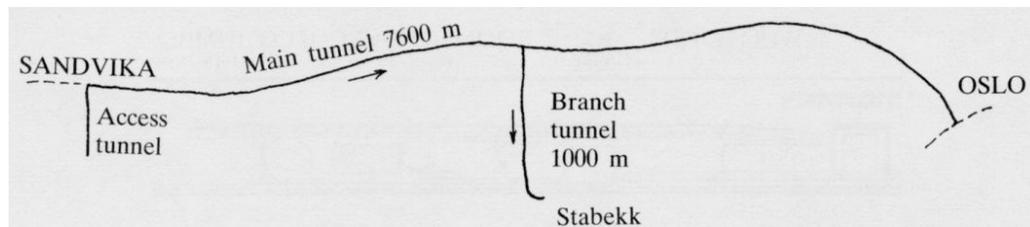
Tunnel system within the contract. Arrows indicate boring direction.
